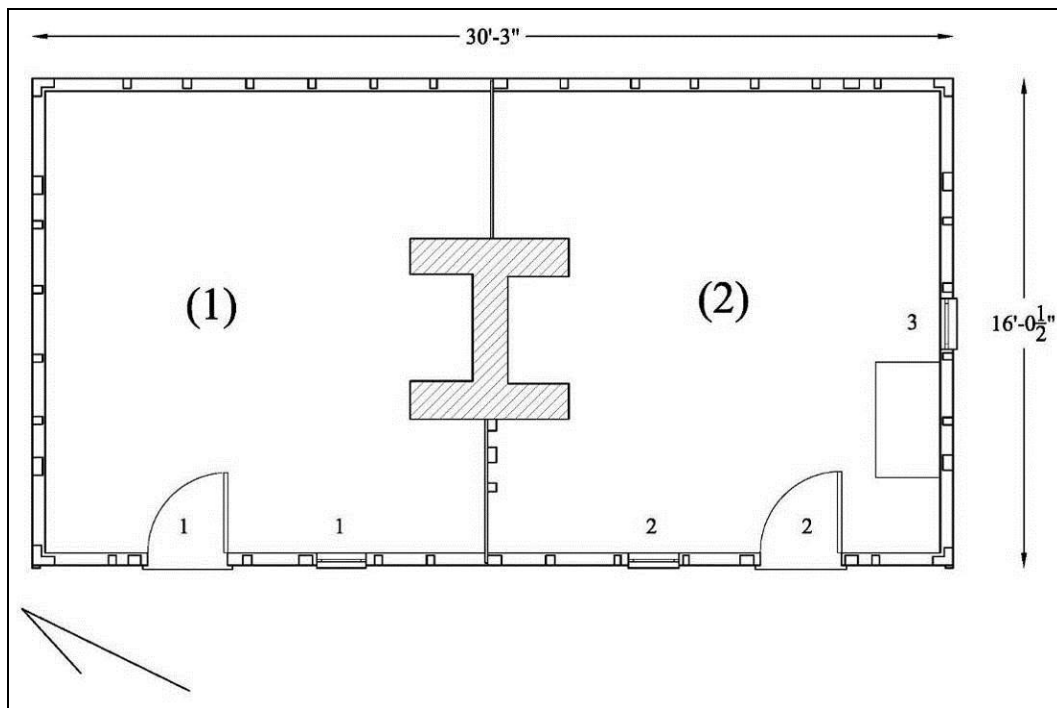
Sherwood Forest Duplex Detailed First Floor Plan.
